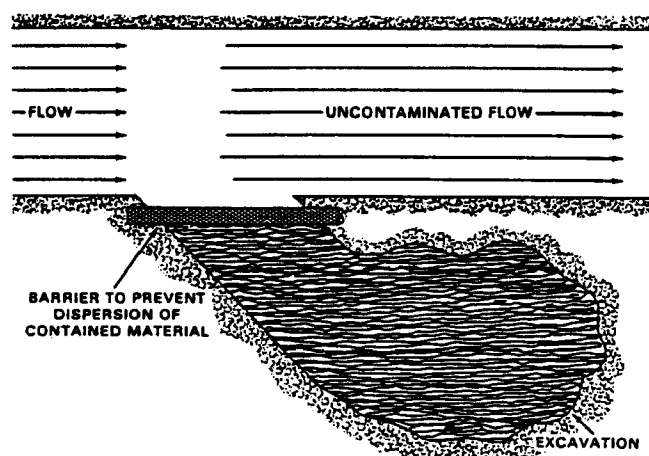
Bank excavation to collect pollutants (plan view). (48)
